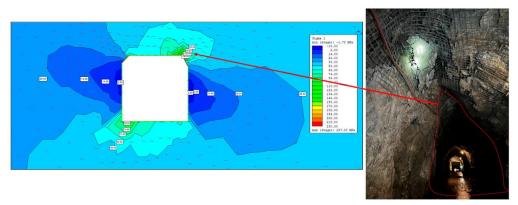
Caving zones around the haulage roadway at horizon +265 m
